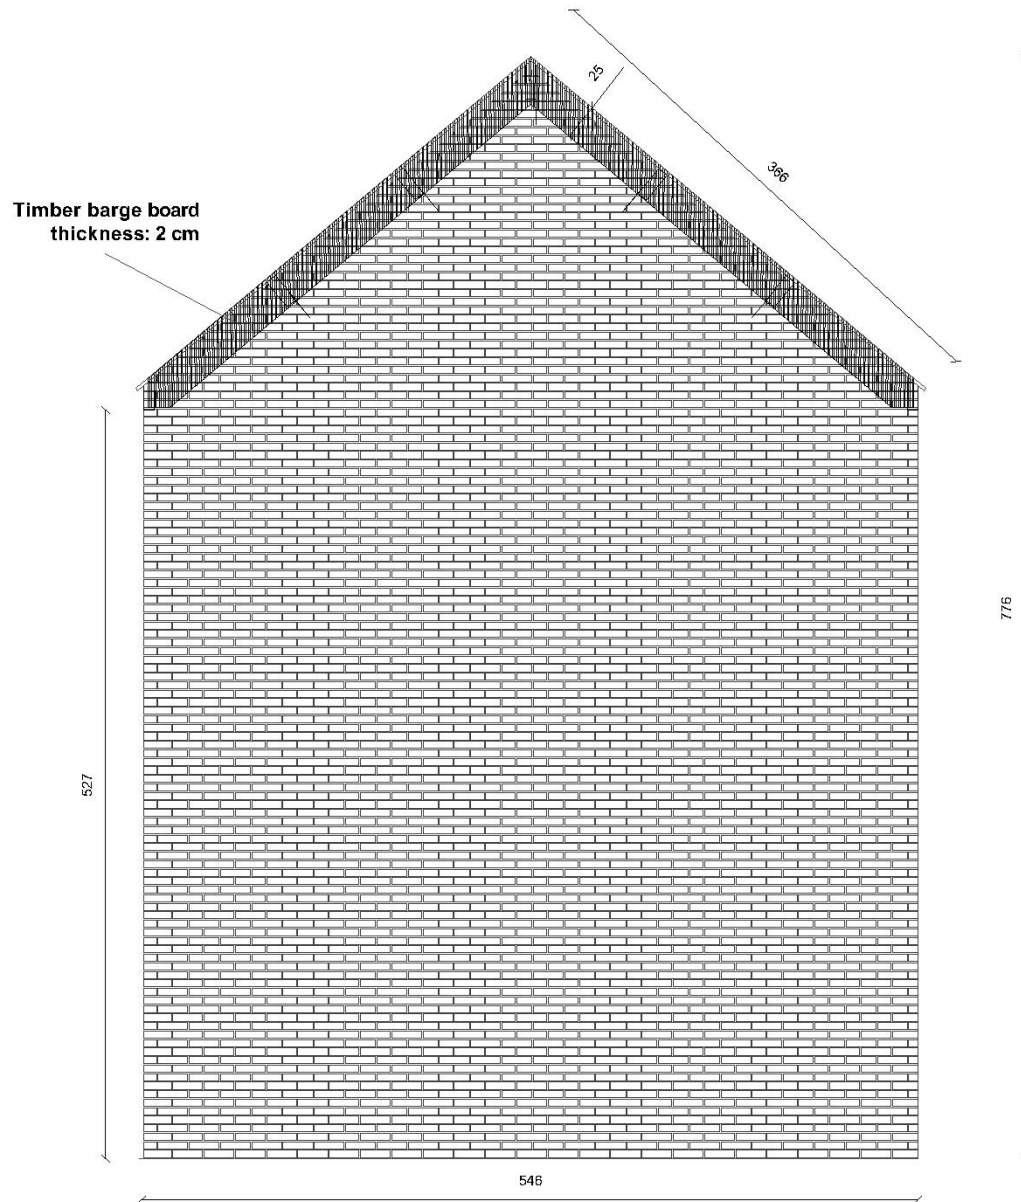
Elevation view of the test-house - outer leaf - north and south side
